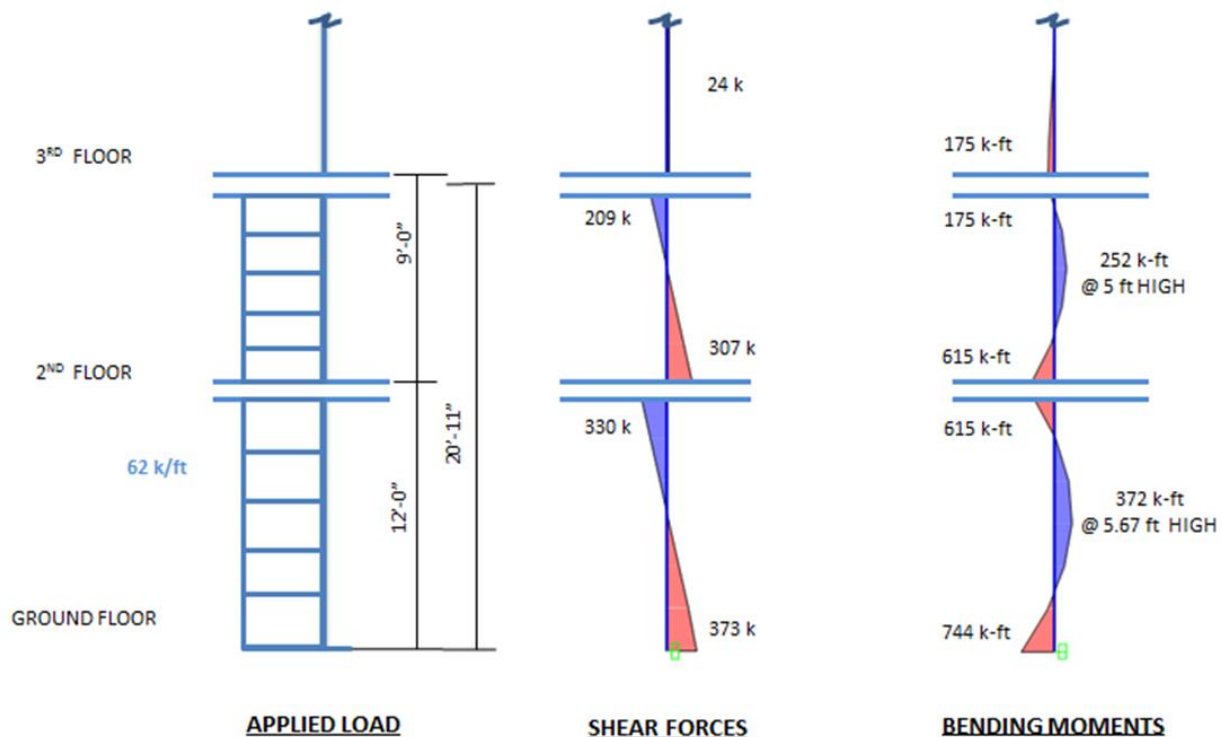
Hydrodynamic loading on exterior column of Seaside residential building due to Load Case 2
